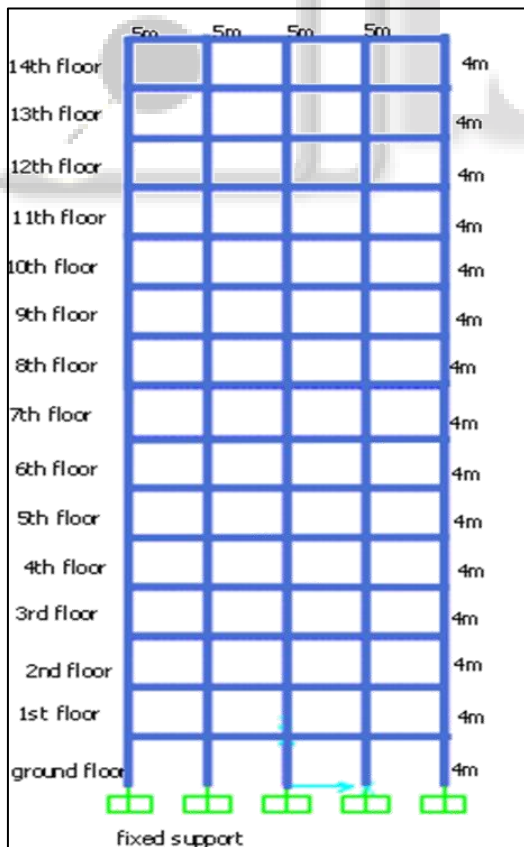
elevation plane of 2d 15 storey building structure without shear wall
